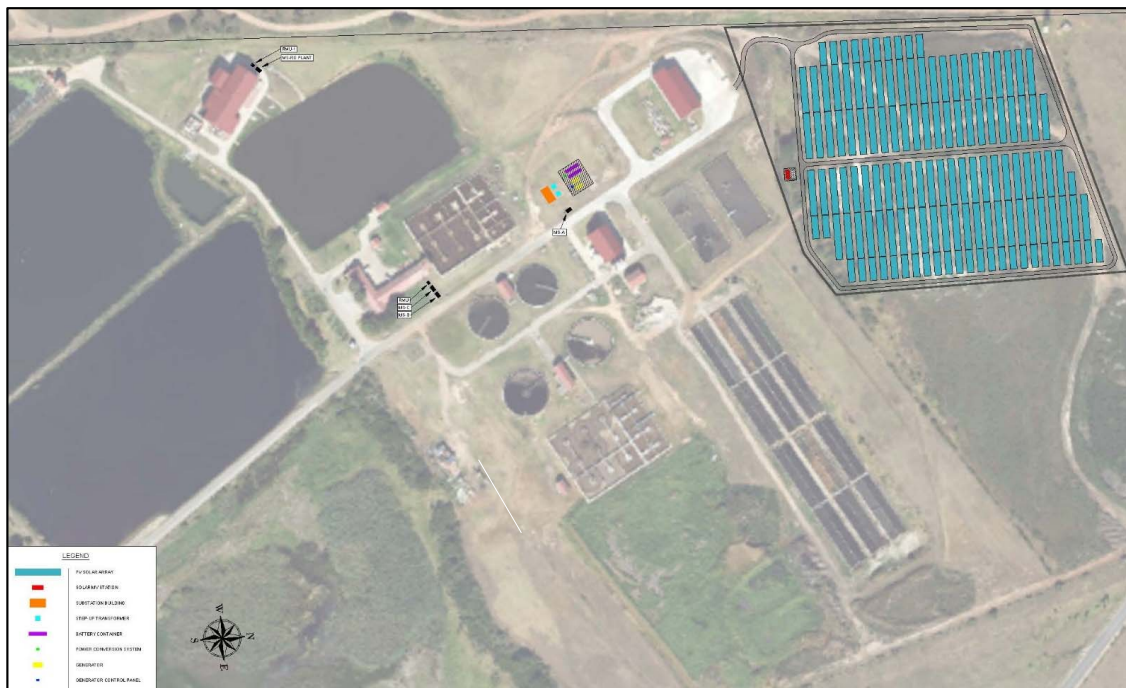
The proposed Preliminary Site Development Plan showing the positions of various associated equipment on the site (Source: Element Consulting Engineers)
